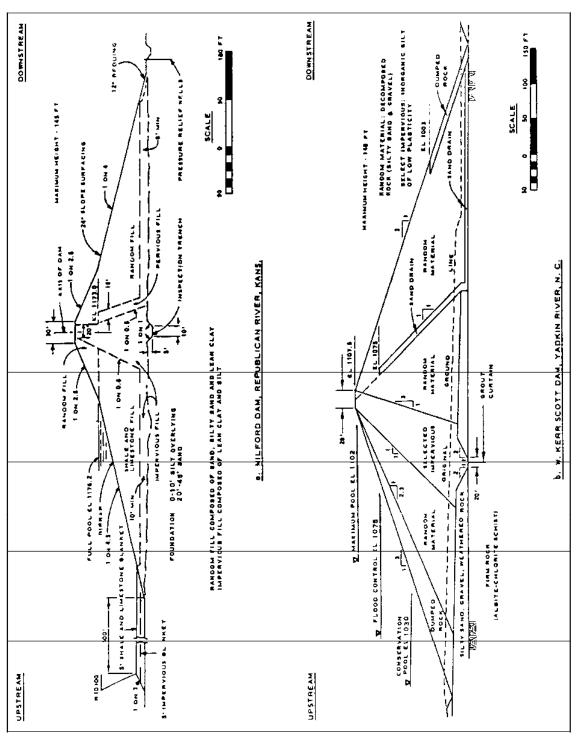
Typical embankment sections, earth dams (Milford and W. Kerr Scott Dams)
